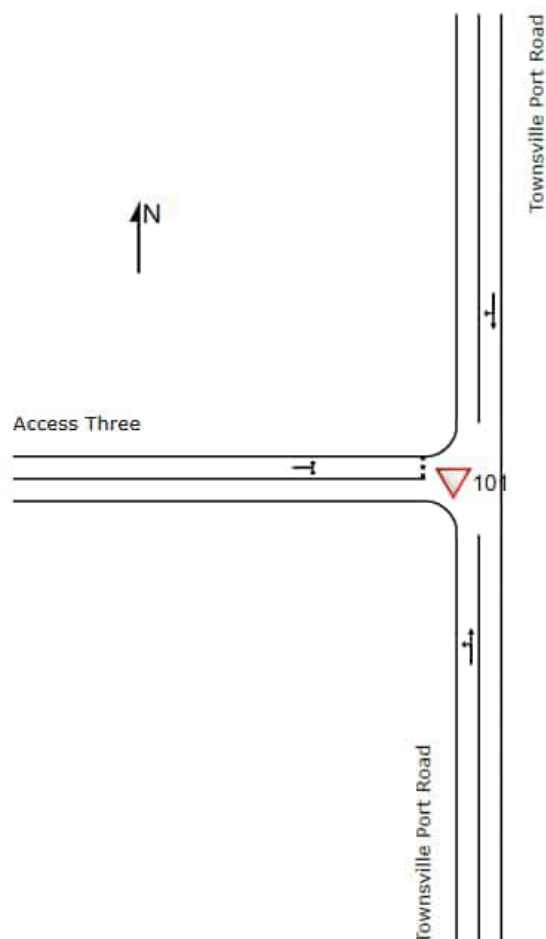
Access 3 / Townsville Port Road intersection – indicative SIDRA layout
